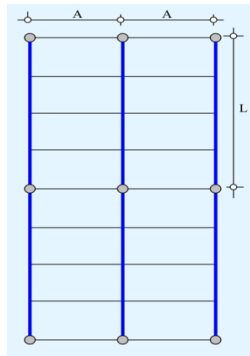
Secondary Trussing. An arrangement of secondary trussing in between primary trussing segments shown in blue (Secondary Trussing Arrangement, from (“Steel Buildings in Europe”, 2008)). A similar scheme was incorporated for members added for lateral stability at the bottom chord of the solar mounting.
